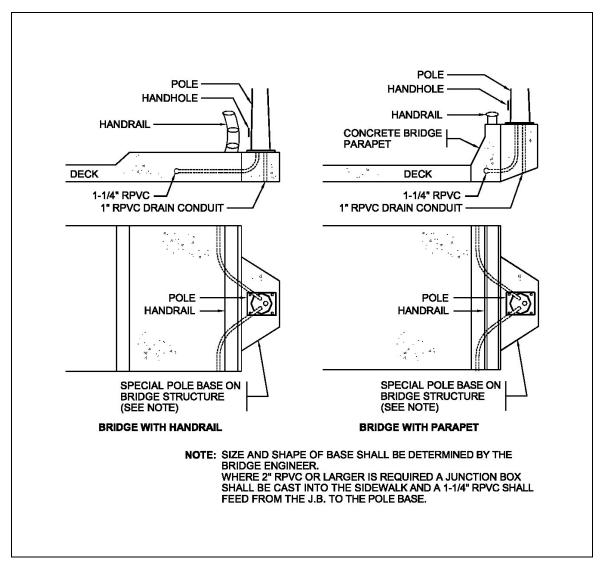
Typical Luminaire Pole Mounting on Bridge Structures
